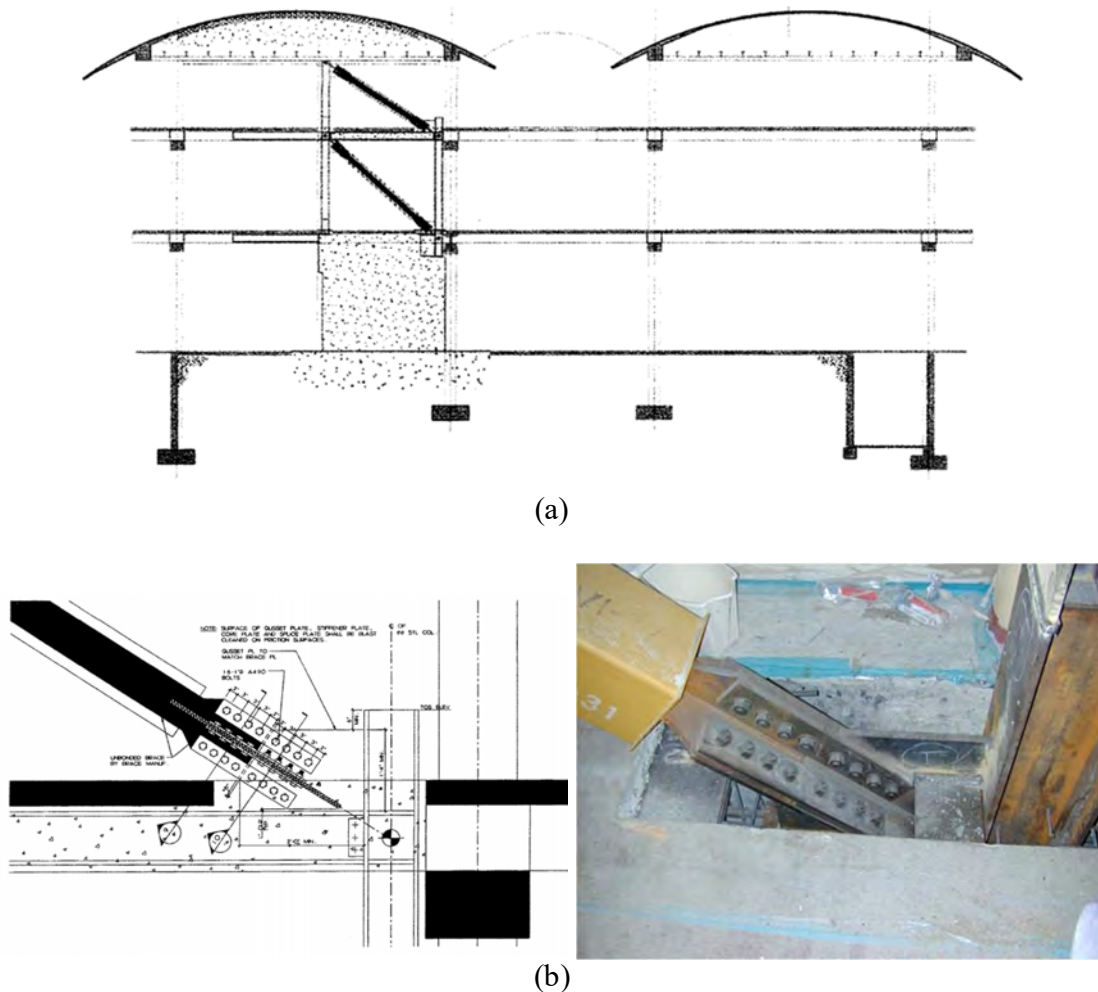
Martin County Hall of Justice Building a) Section Drawing of Retrofit Plan with BRBs and Shear Walls; b) BRB Connection Details (Shaw et al. ,2000)
